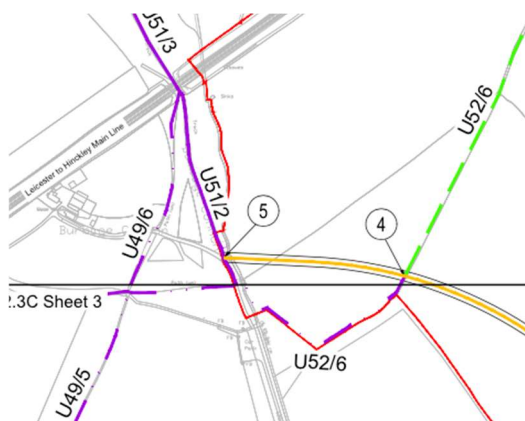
illustrates the location plan of the footbridge at No. 5 creating a link to No. 4 and creating a new PROW.
